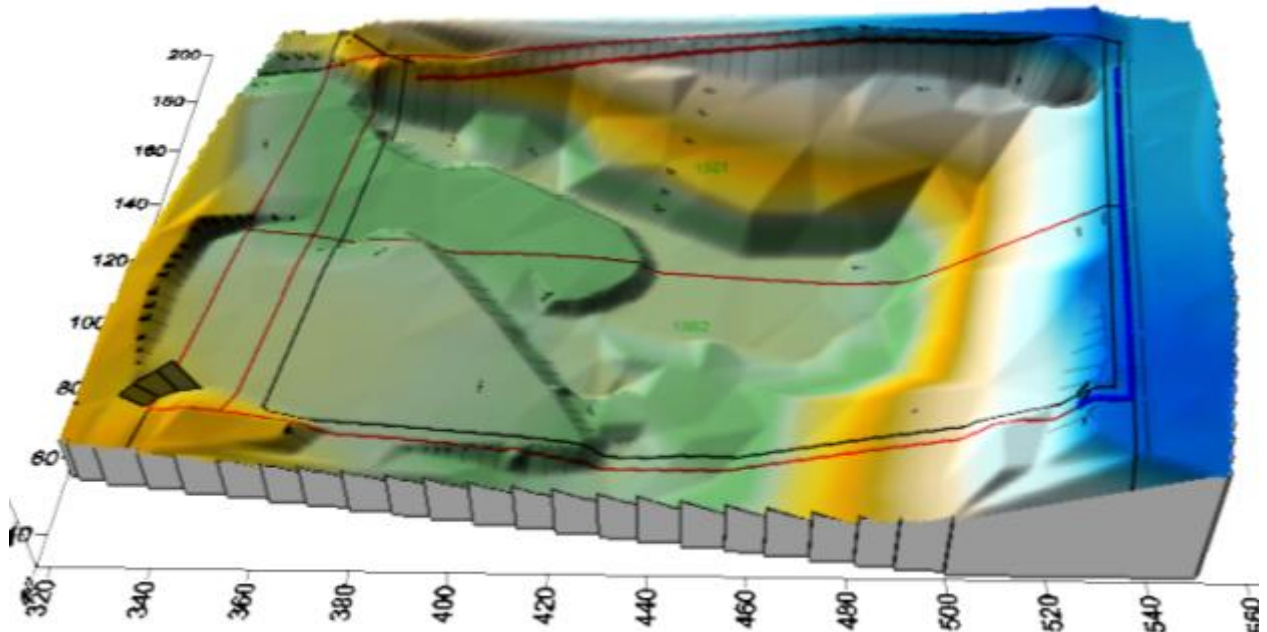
Land profile suitable for soil nail system due to different ground elevations surrounding the site.
